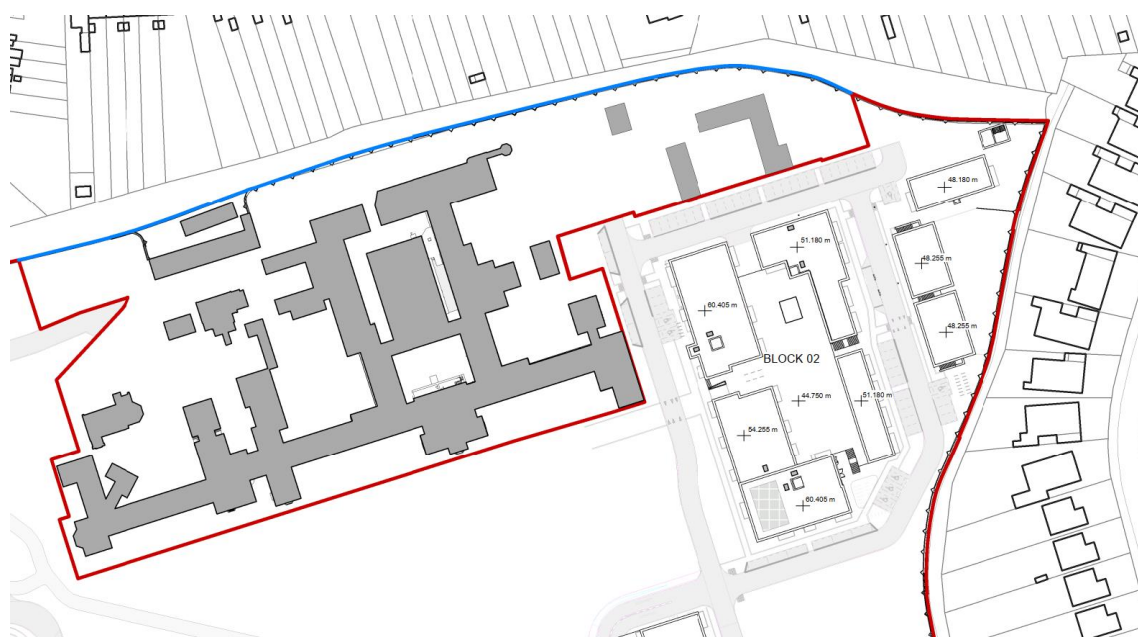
Apartment Block Construction to east of Main Hospital Building
